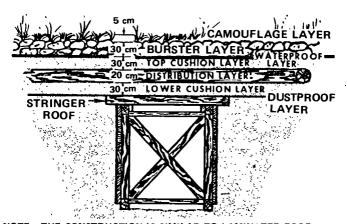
Heavy overhead cover (laminated roof construction).
